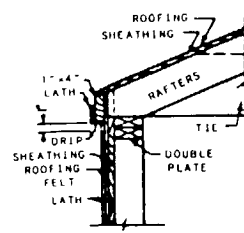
DETAILS are large-scale drawings of the construction assemblies and installation that were not clearly shown in the sections. These enlarged drawings show the user how the various parts of the structure are to be connected and placed. The construction of specific types of foundations, doors, windows, cornices, and so forth, are customarily shown in detail drawings located within their applicable main division of the construction drawings. Details are usually
